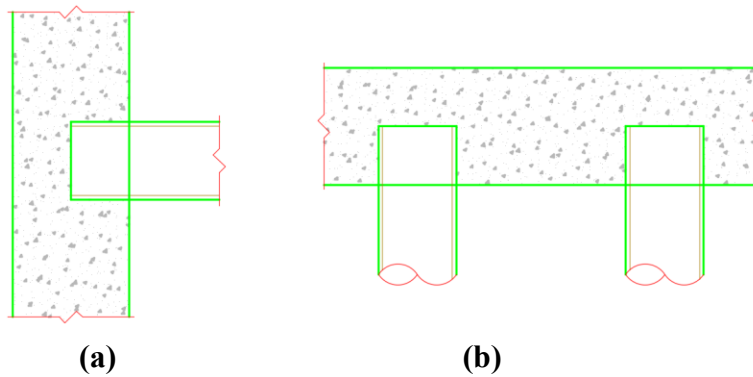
Examples of Composite Connections: (a) Concrete Column and Steel Beam Connection, and (b) Steel Pile to Concrete Pile Cap
